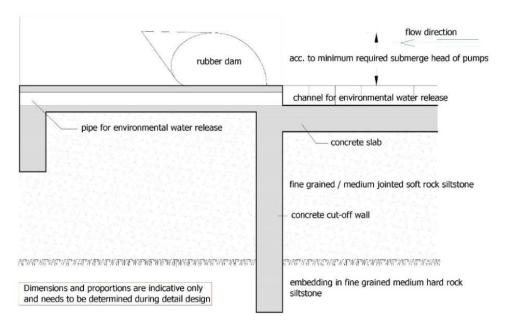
Cross-Section trough the proposed rubber dam (Posch and Partners, July 2018)
